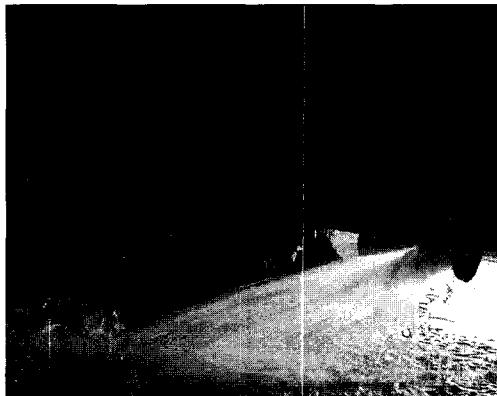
Leakage at bottom seat of butterfly valve due to the cavitation at Gwangdong Dam
